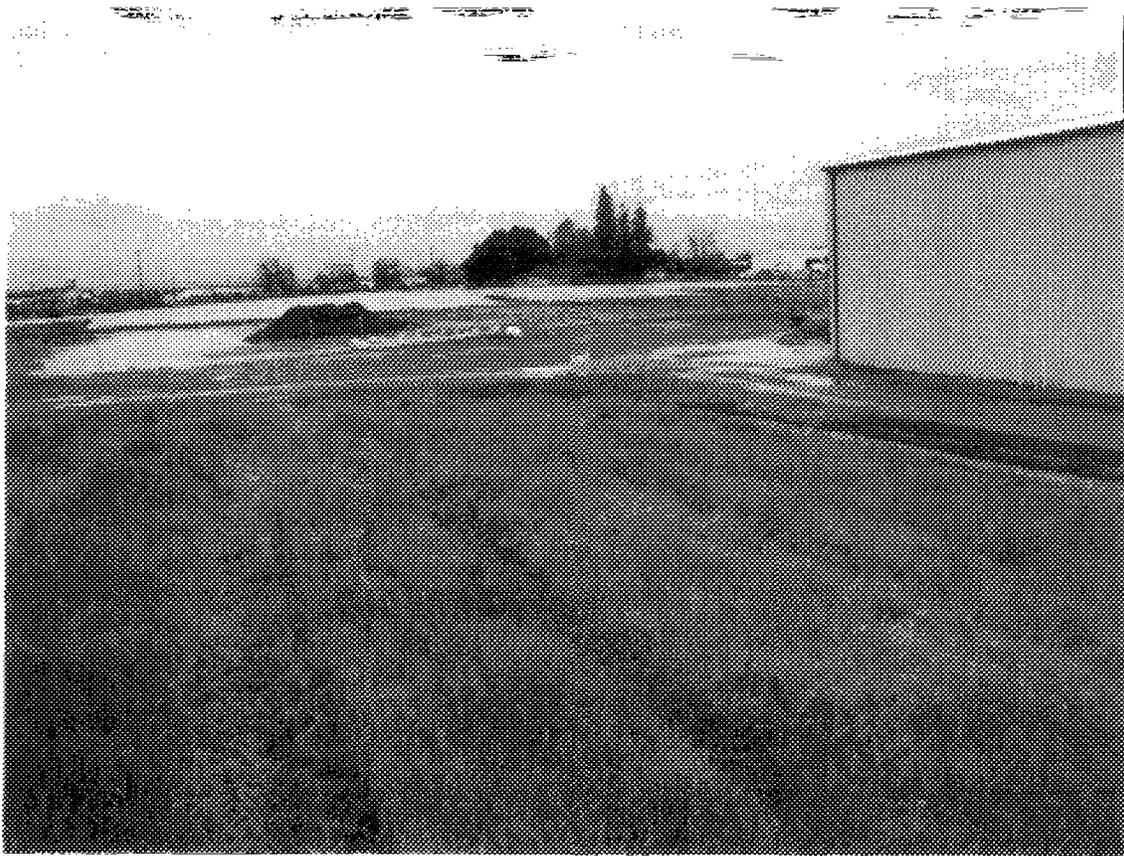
Top of soil impoundment looking east toward asphalt paved soil remediation area
